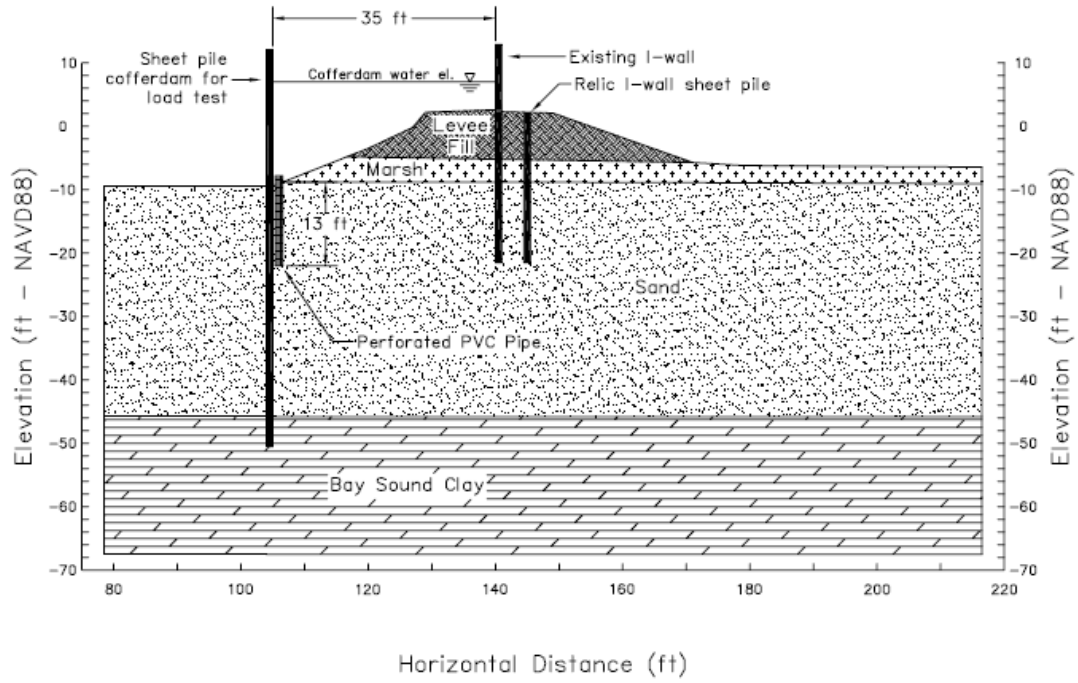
Cross Section for Analysis of Injection Wells with Fully Penetrating Sheetting
